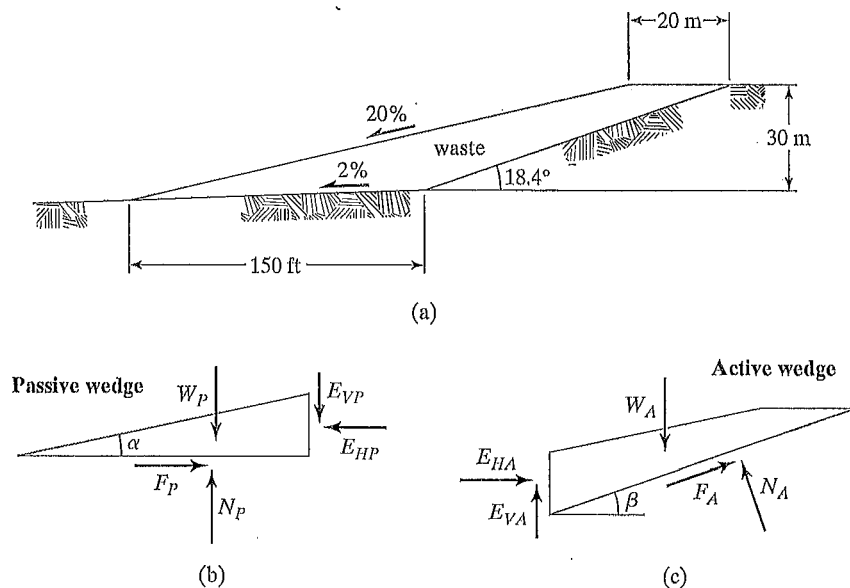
Cross Section of a Solid Waste Landfill during Filling Condition
